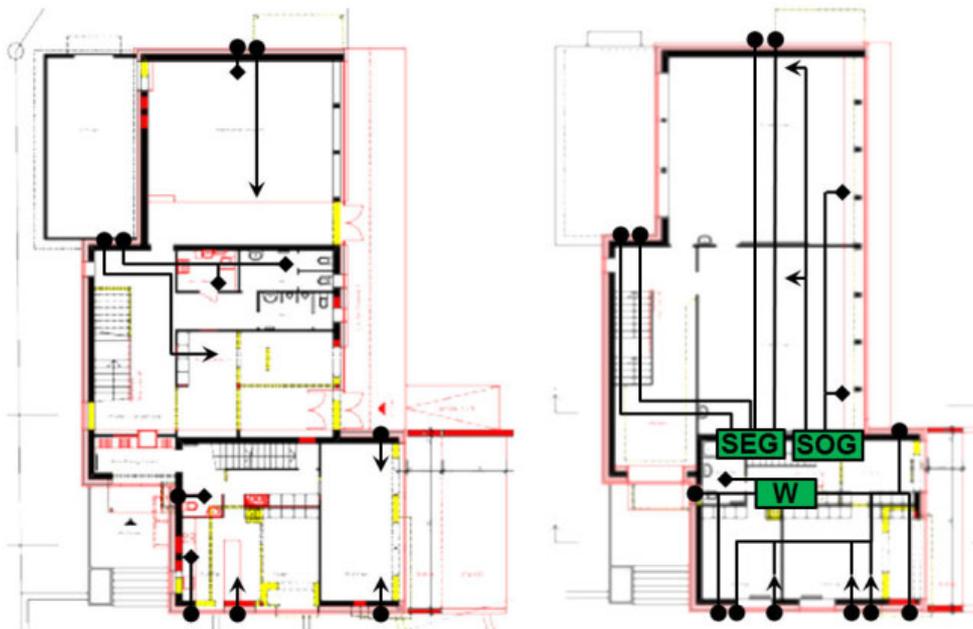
Floor plans of the Krumbach-building – left: ground floor / right: first floor
